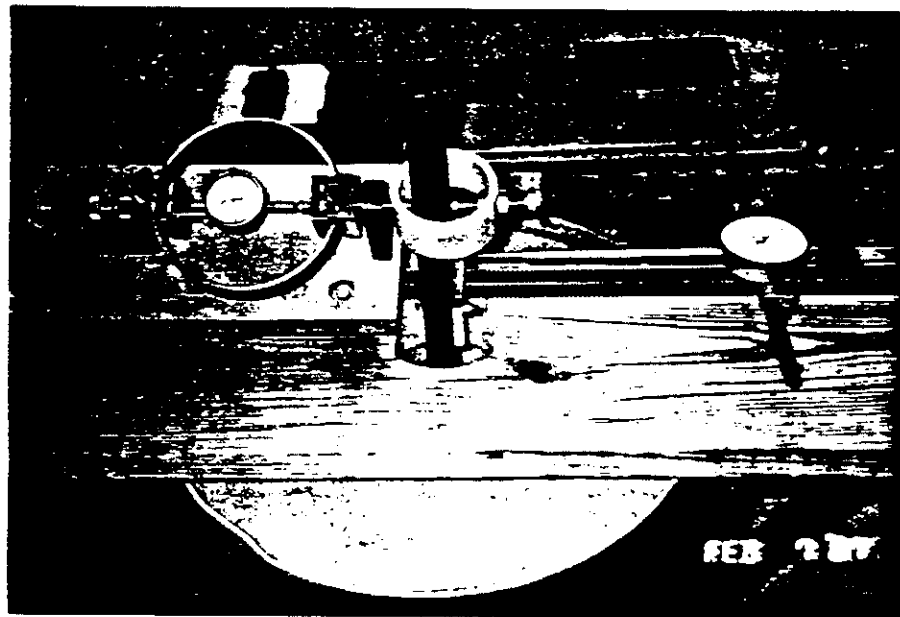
Pile-to-proving ring Connection and Dial Gages on Two-way Cyclic Test Apparatus.
